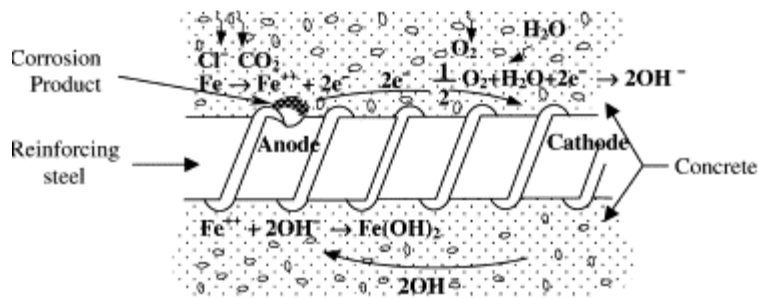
Electrochemical Reactions during corrosion of reinforcing steel in concrete (Ahmad, 2003)
